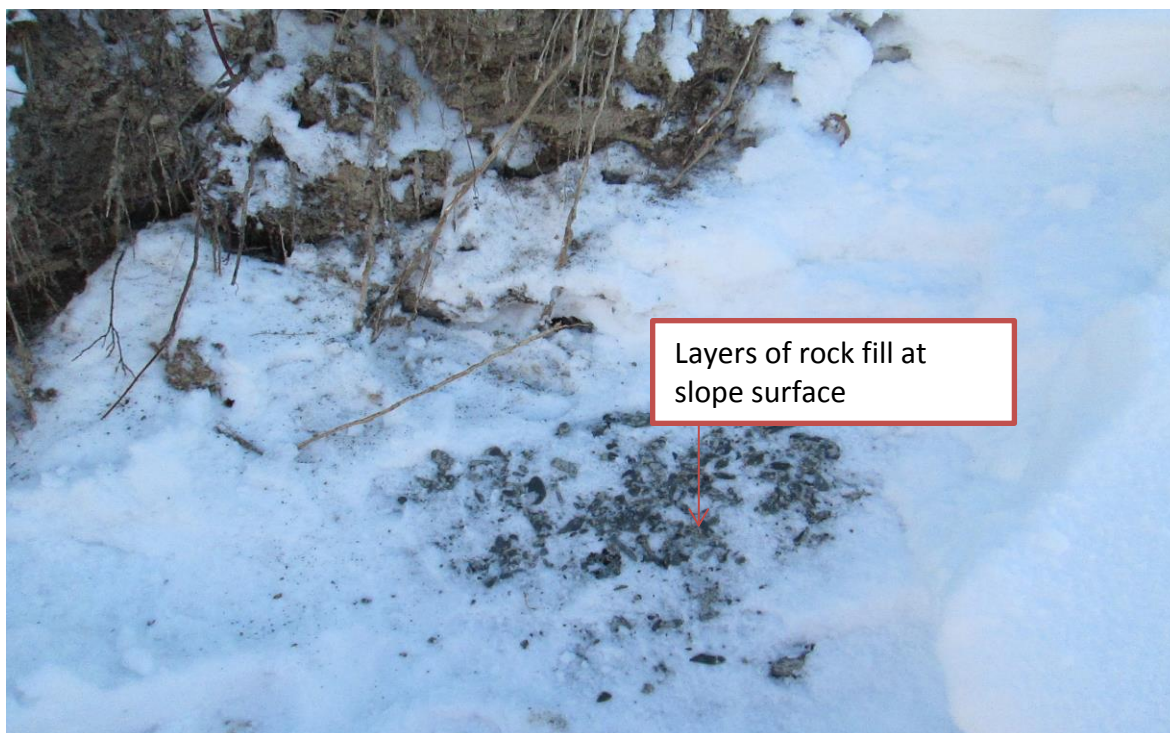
Layer of rock fill at depressed slope surface - north side (outlet) of embankment
